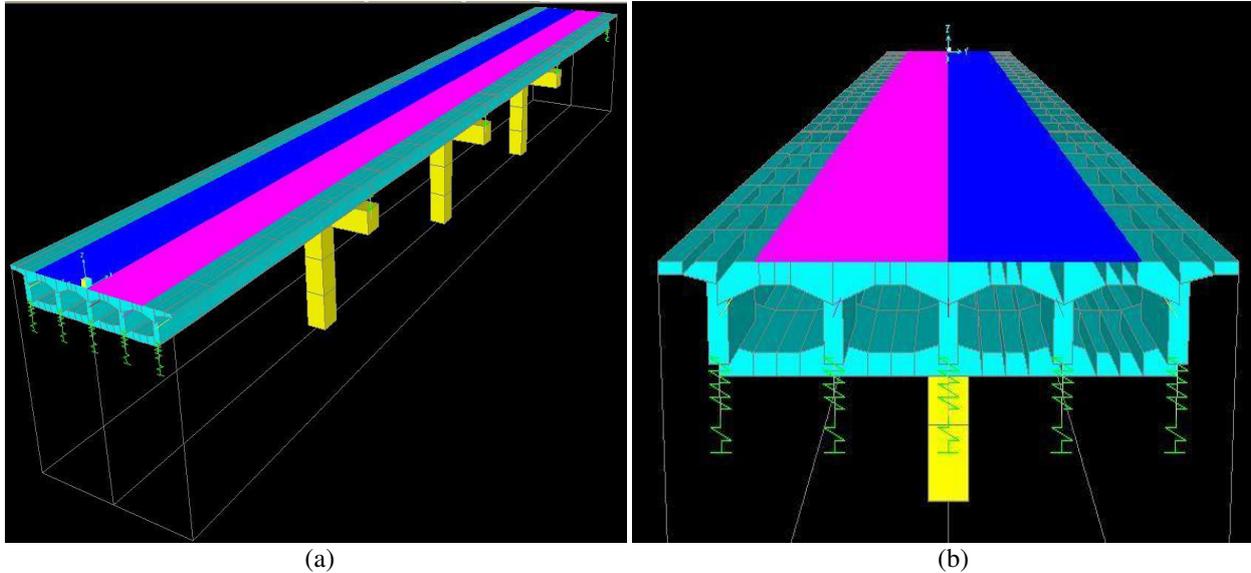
The bridge model: (a) longitudinal section, (b) transverse section.
